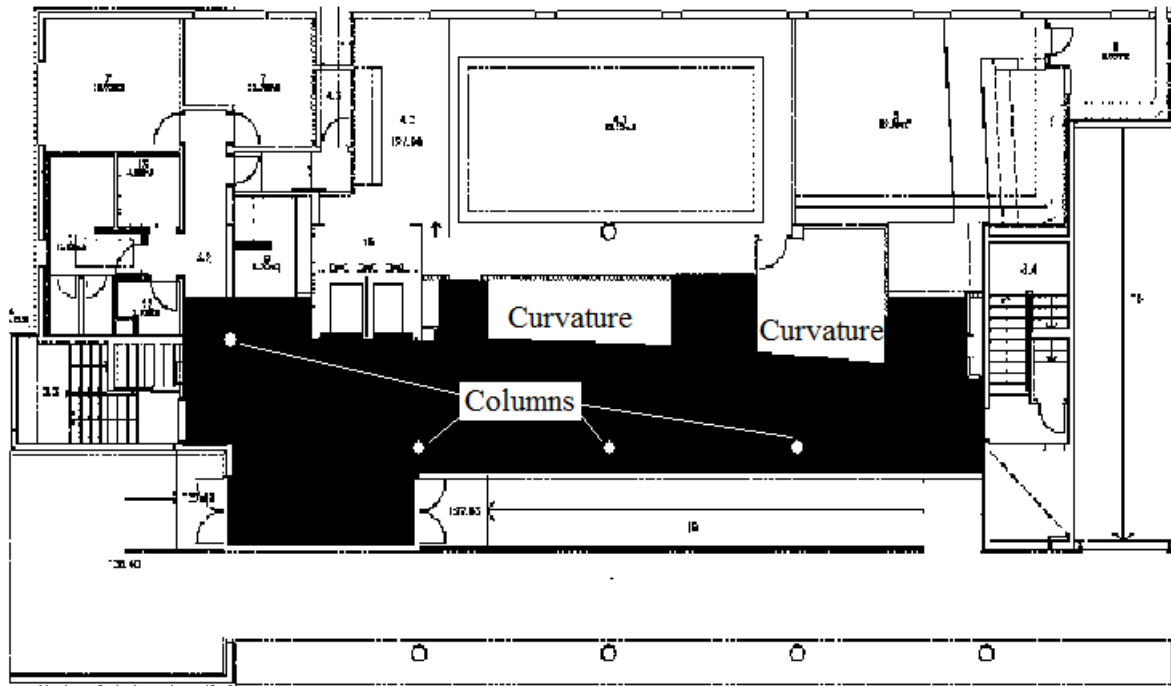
Architectural plan of the INESC TEC building, first floor, scenario 5).
